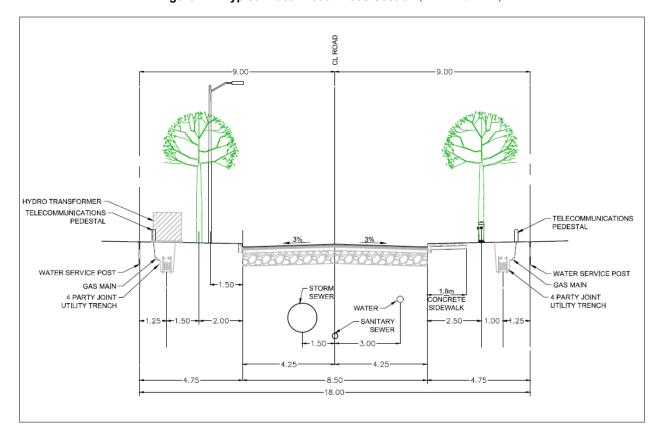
Typical Local Road Cross Section (Source: KNUEA TMP)
